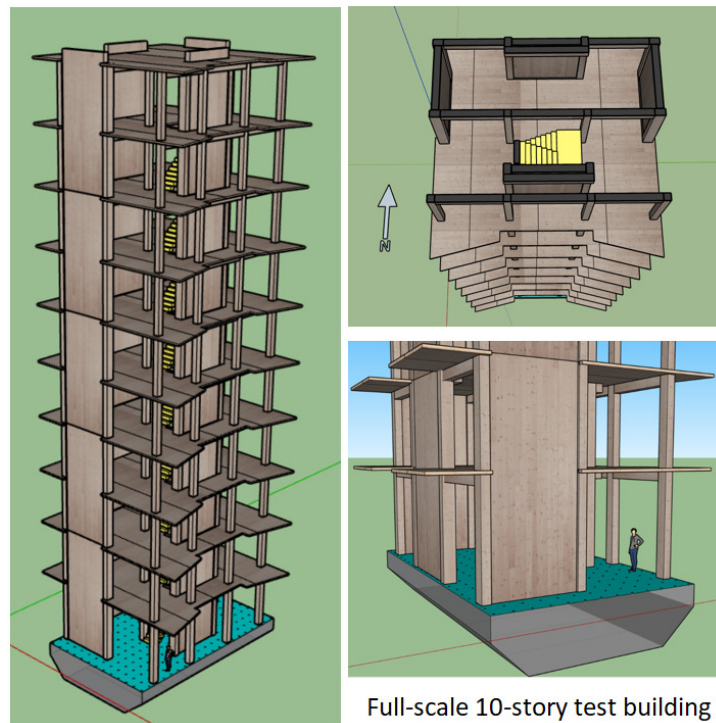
3D model of the planned 10-story test building on the UCSD shake table
